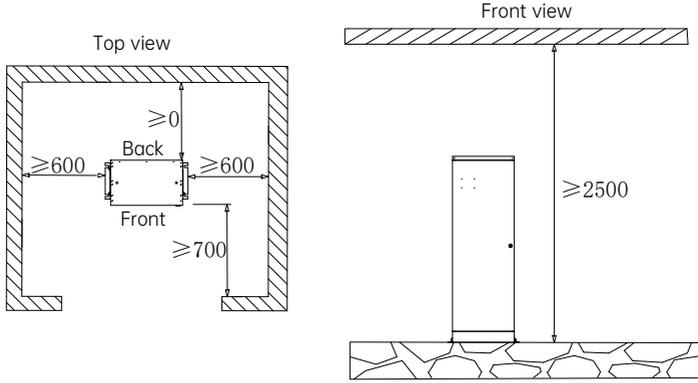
Diagram of MR cabinet installation space requirements (unit: mm)
